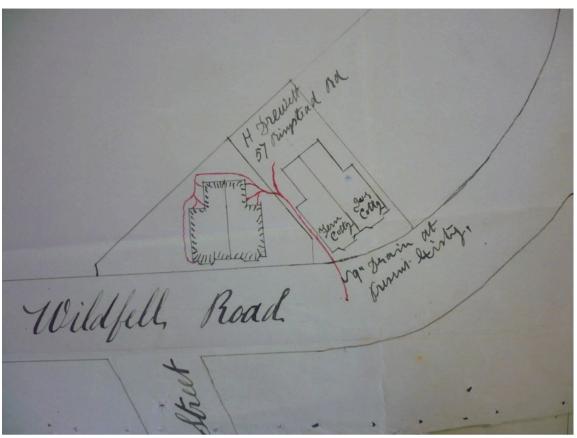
Drawings submitted with the building application for some of the first houses built by Watt in 1890. The drawings are not to scale and the drains are drawn free hand with red ink, probably by Watt himself. The building applications became more demanding in accuracy and technical detail in the Edwardian period, which was one of the reasons for a builder to employ an architect or surveyor such as Norfolk & Prior to deal with the applications (Building & Drainage Applications 1856-1900, Vol. 50, Lewisham Local History Archive).
